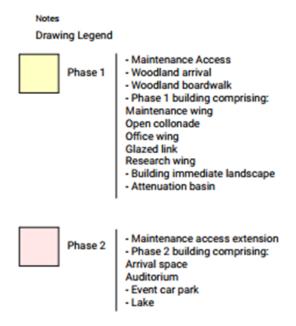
Drawing Legend and labels for Proposed Block Phasing Plan (Fig 1.0)
